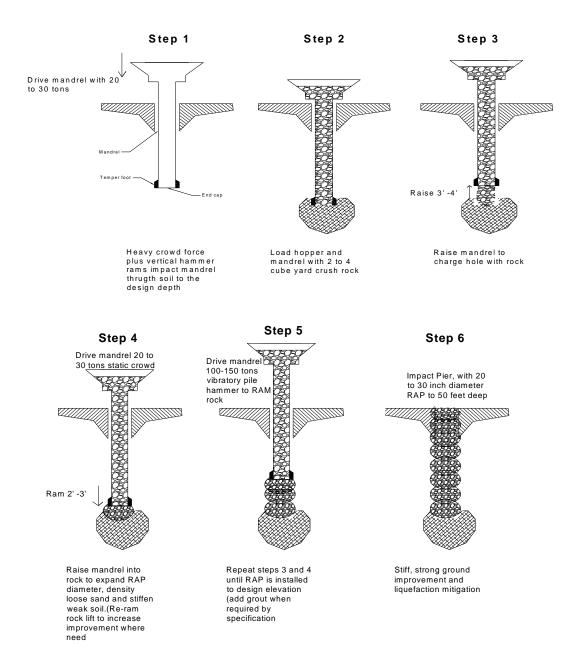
Impact rammed aggregate pier installation process (after Farrell Inc.)
